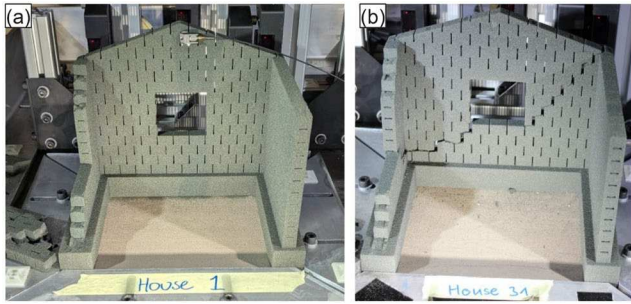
Typical failure modes observed in the tested model buildings: (a) West wall failure only (Specimen 1); and (b) West and North wall failure (Specimen 31).
